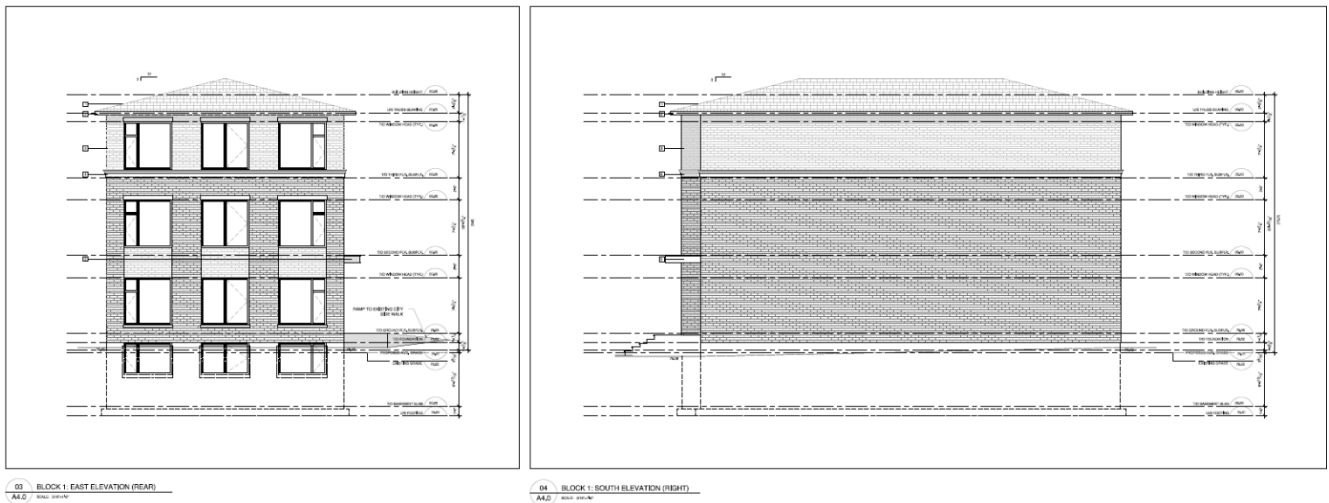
Lot 1 East (Rear) Elevation and South (Right) Elevation
